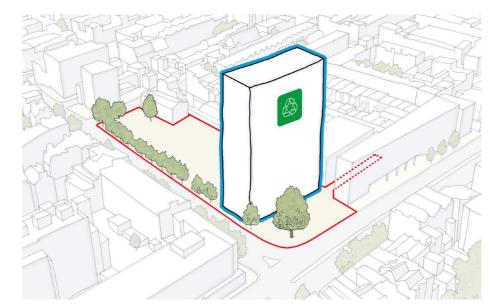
Site cleared and retention of the existing structure to Newcombe House
